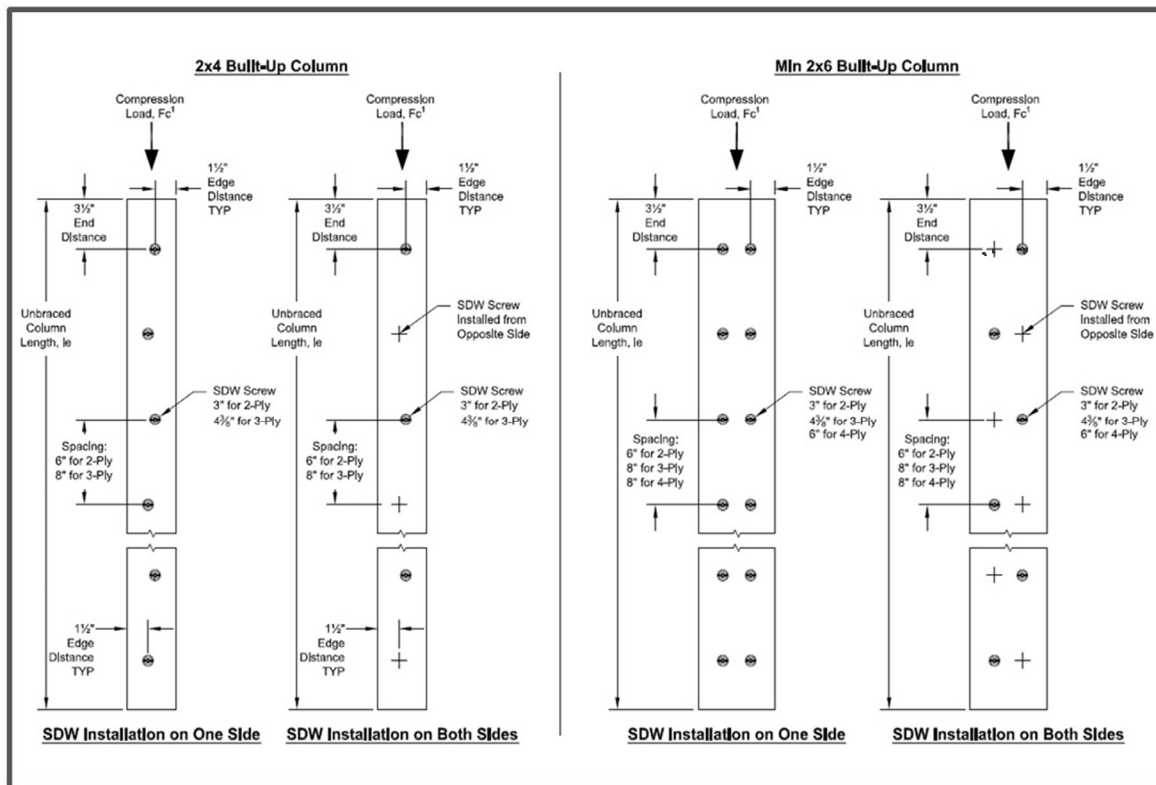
Fastener Schedule for Built-Up Columns Fastened with Strong-Drive® SDW Truss-Ply Screws.
